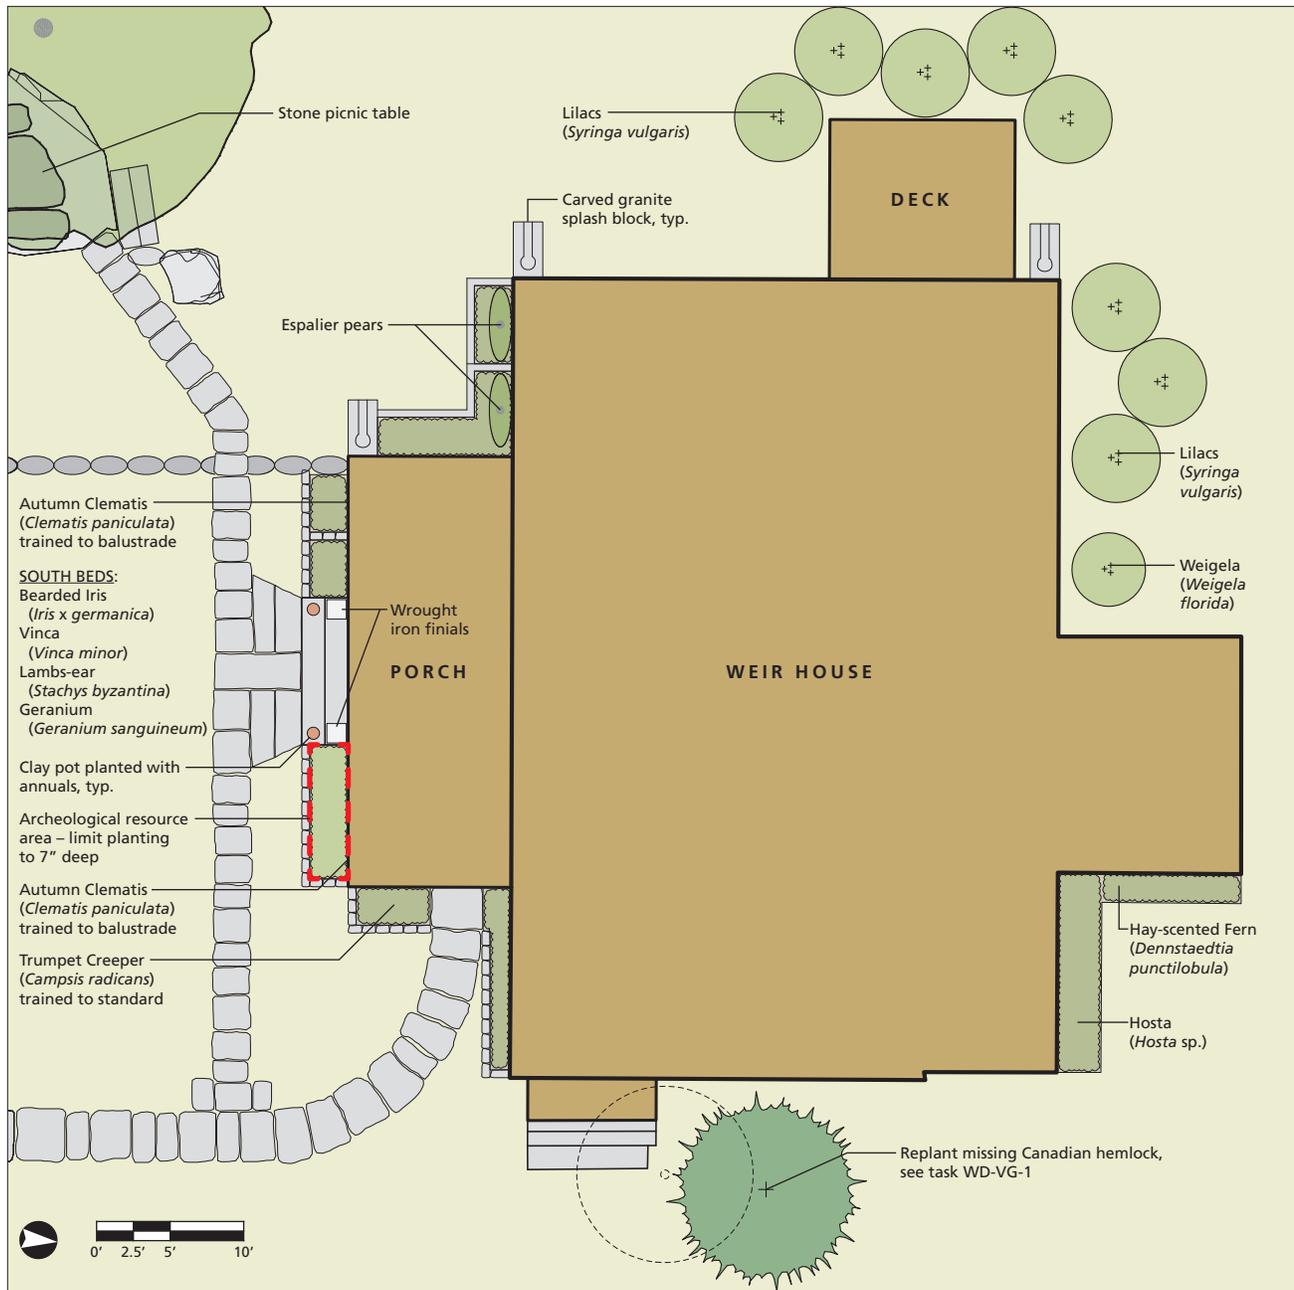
Diagrammatic plan showing replanted foundation plantings at the Weir House, 2012 (OCLP).
